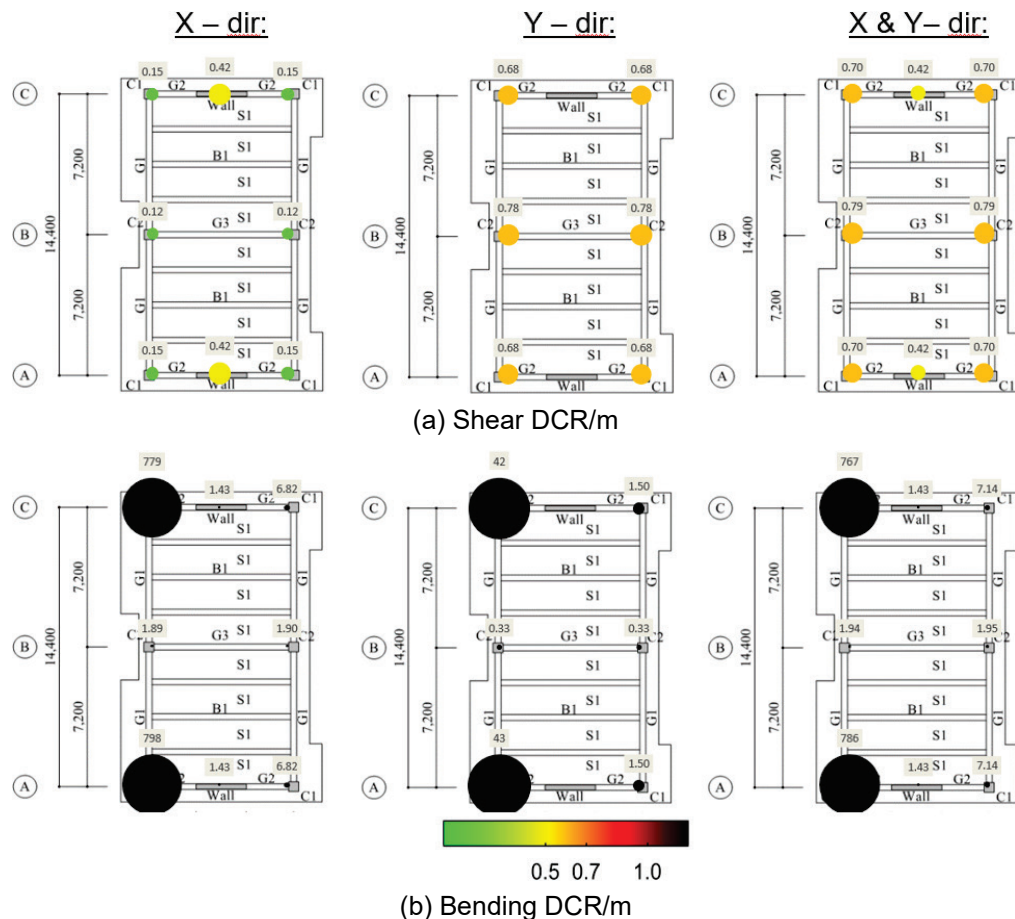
LDP: Collapse Prevention DCR/m at first story.
